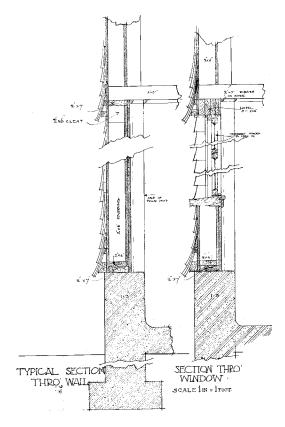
Early wall sections by Brown and Vallance archtiects showing a wall structure of 2x6 studs rather than load bearing stone.
